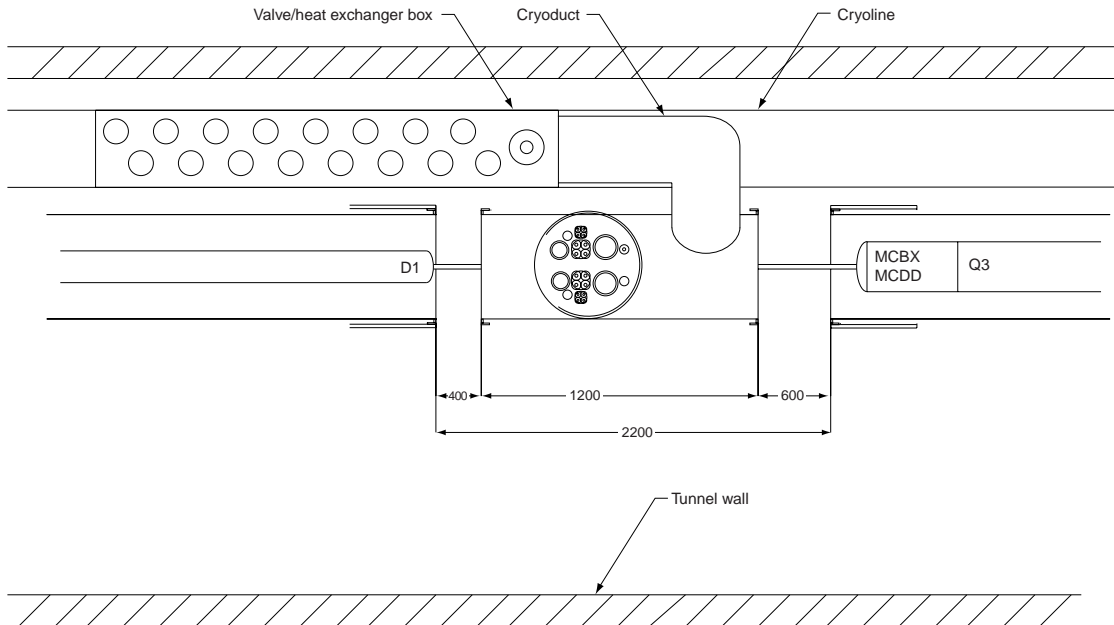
Plan view of IR8 left feed box installation.
